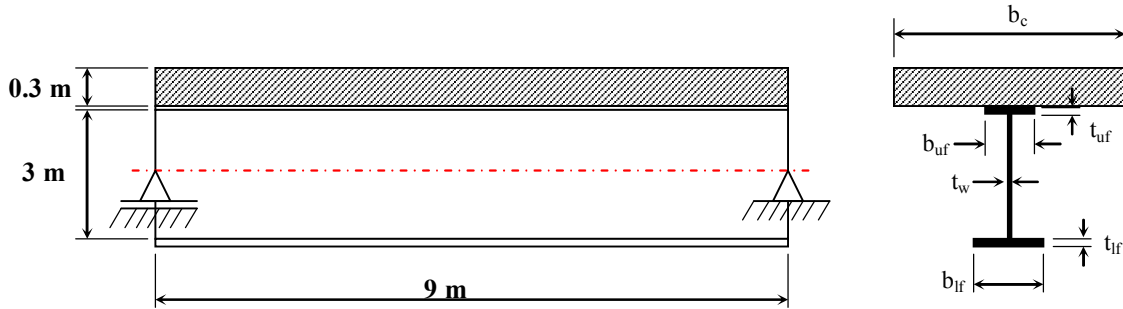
Simplified composite girder structure and its dimensions
